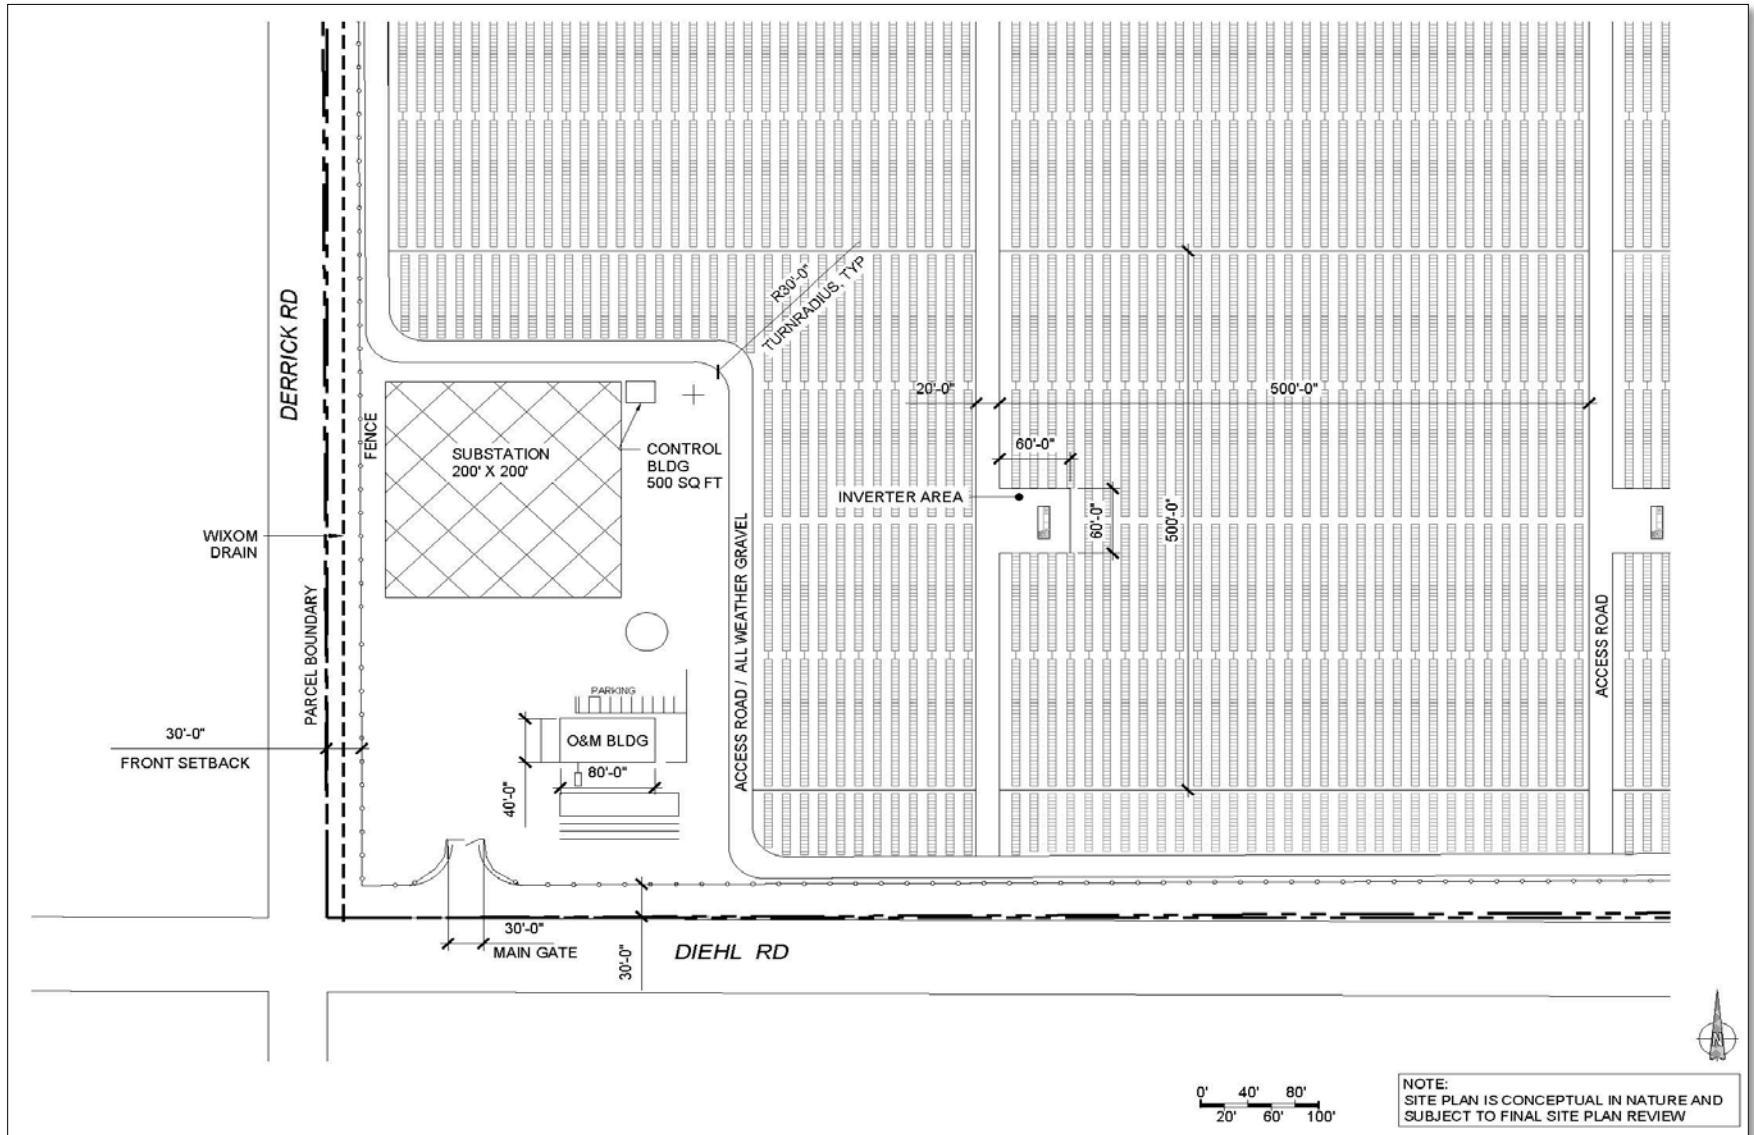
Laurel 3 Solar Farm 3 – Site Layout
